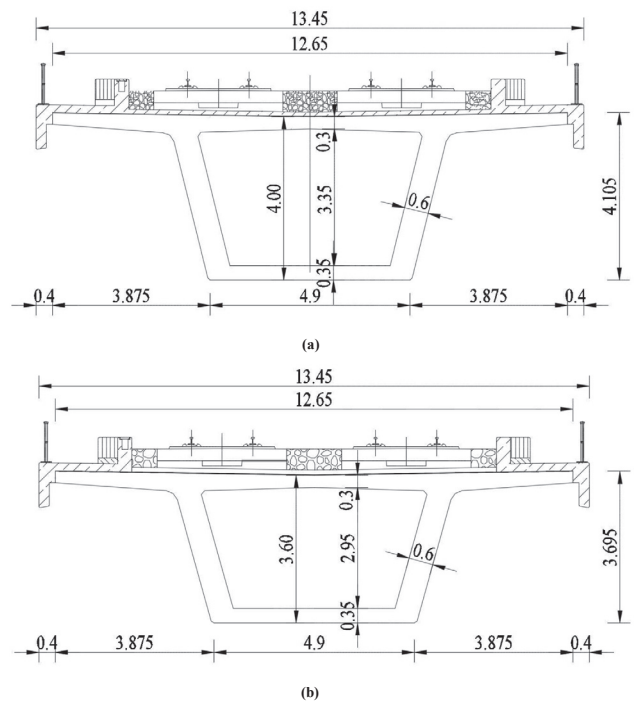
Cross sections of two 44-m-span bridges [9] (a) Cross section of the 44-m-span simply supported bridge and (b) Cross section of the 44-m-span continuous bridge.
